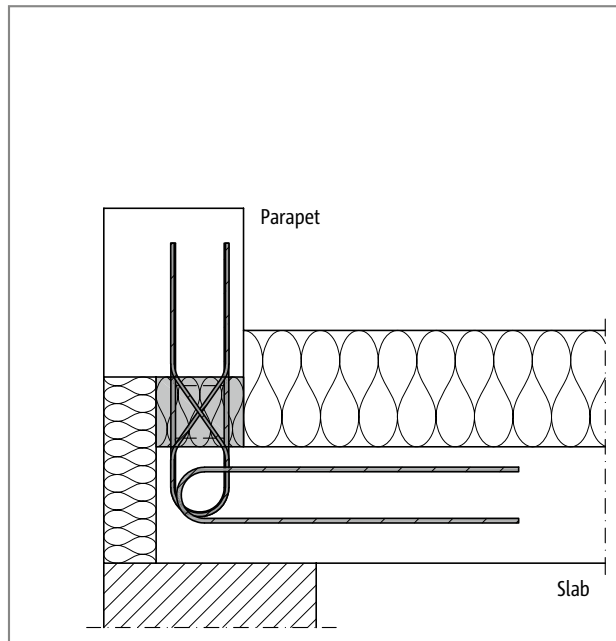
Schöck Isokorb® XT type A: Connection to a parapet (type A-MM1-VV1)
